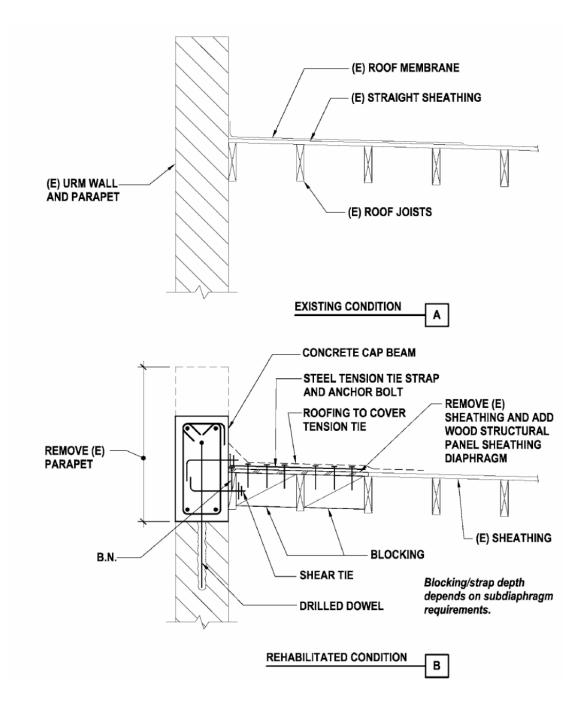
Parapet removal and concrete cap beam installation (FEMA 547, 2006)
